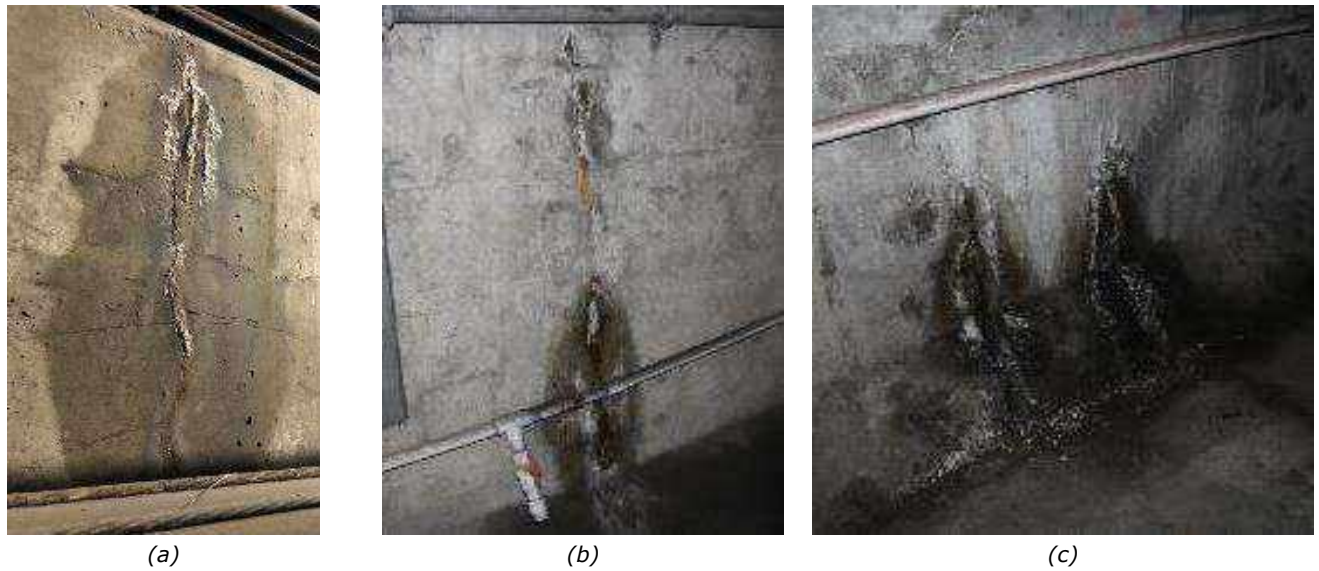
Examples of weeping transverse cracks observed at (a) Upstream Air Duct, Element IV, Door 24, (b) Downstream Air Duct, Element V, Door 25, and (c) Downstream Air Duct, Element VI, Door 33.
